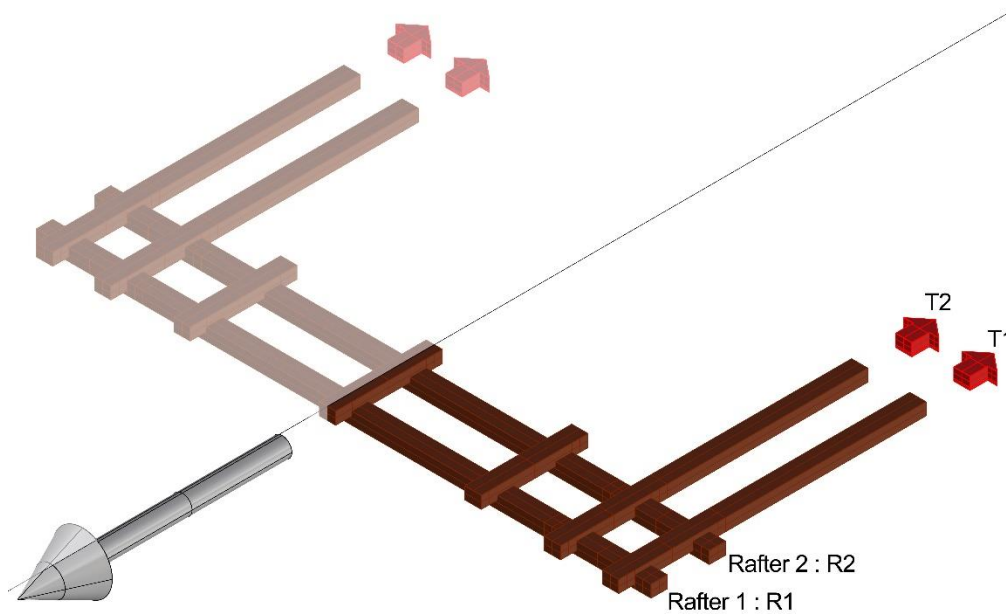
Descriptions of the rafters crossed at the roof timber beam actions (normal rafter)
